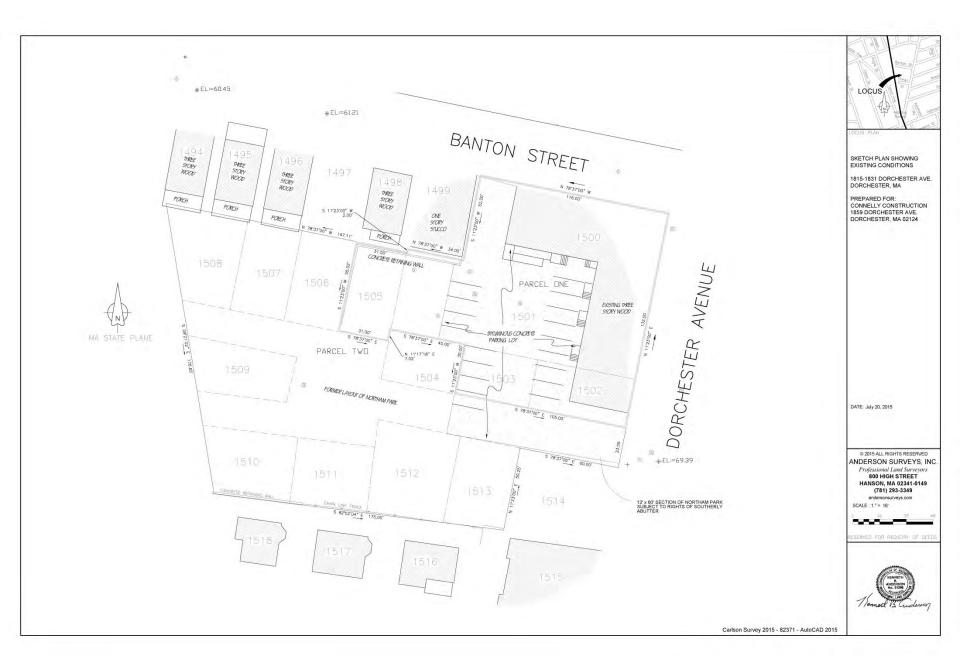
Renderings, Site Plan, Floor Plan, Building Elevations
